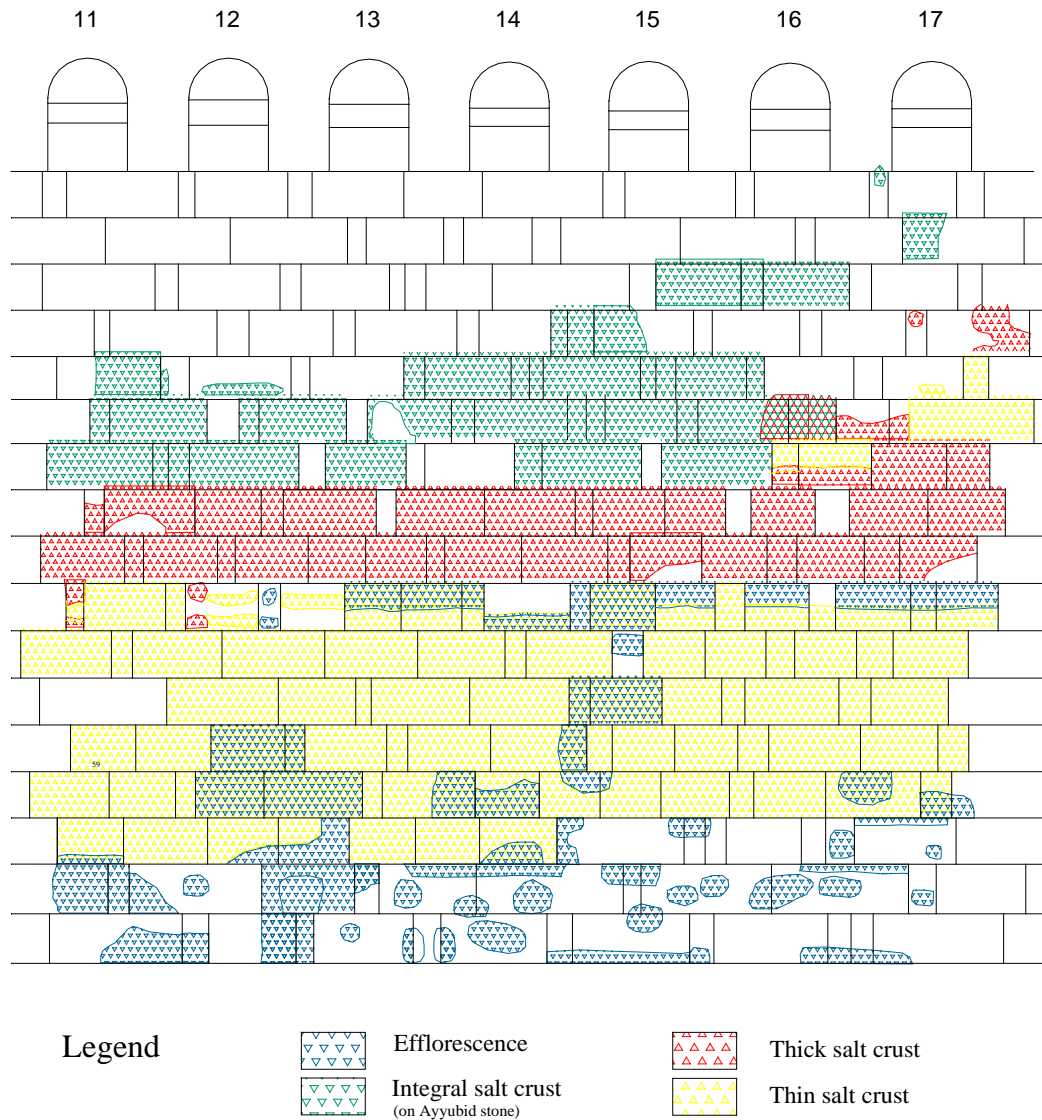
Detail of the survey of salt deterioration patterns between tower 4 and 5 of the eastern section of the Ayyubid wall of Cairo.
